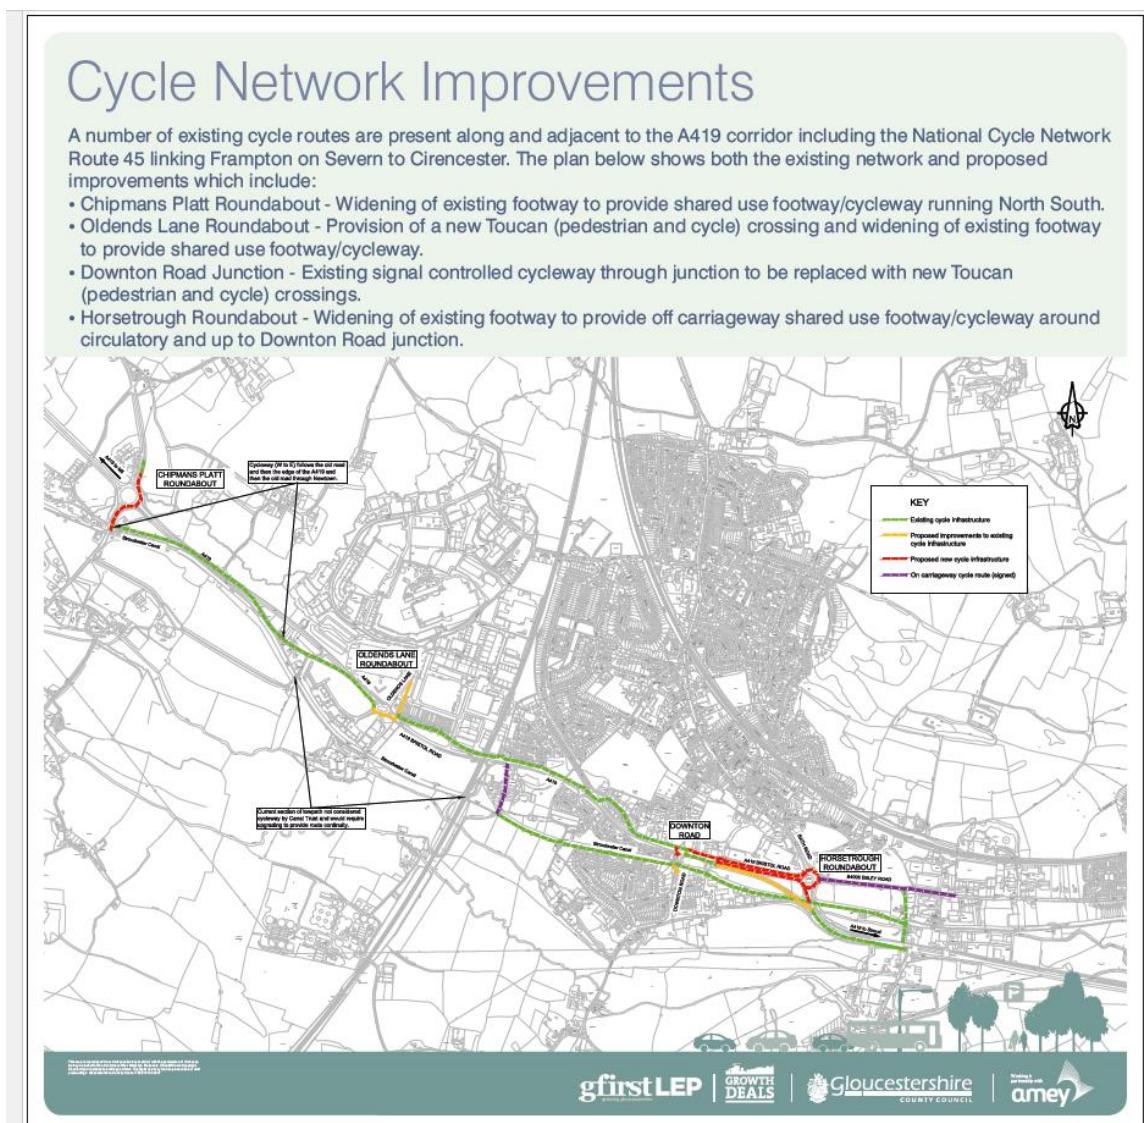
Existing cycle infrastructure and proposed improvements
